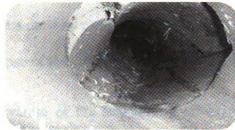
Culvert Pipe showing Cracks and Joint Separation
